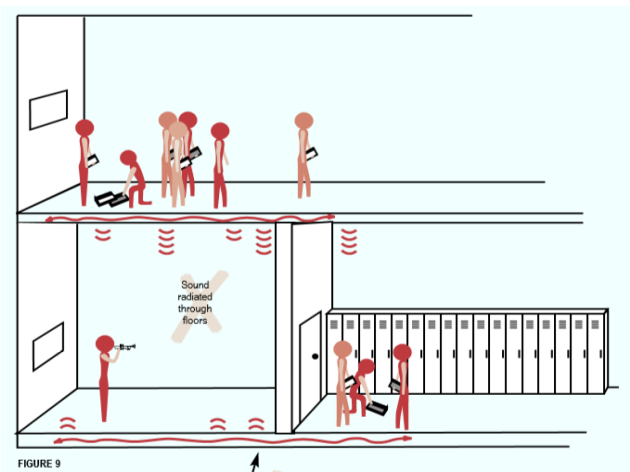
Ceiling and Floor Problem (Ref No. 4).
